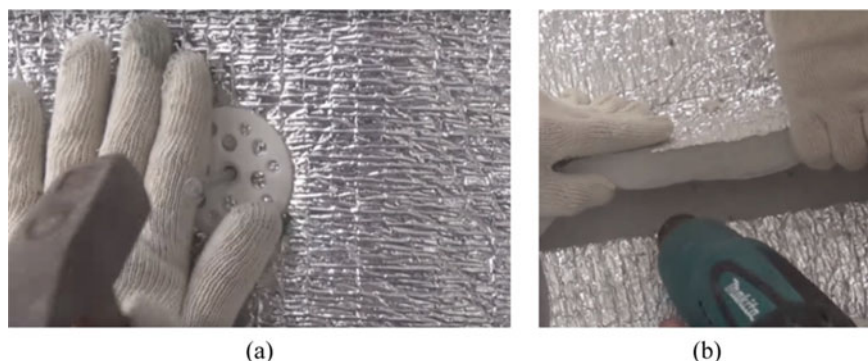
Installation of thermal insulation: a - mechanical fastening of the insulation sheet; b - welding of joints of rolled polyethylene foam
